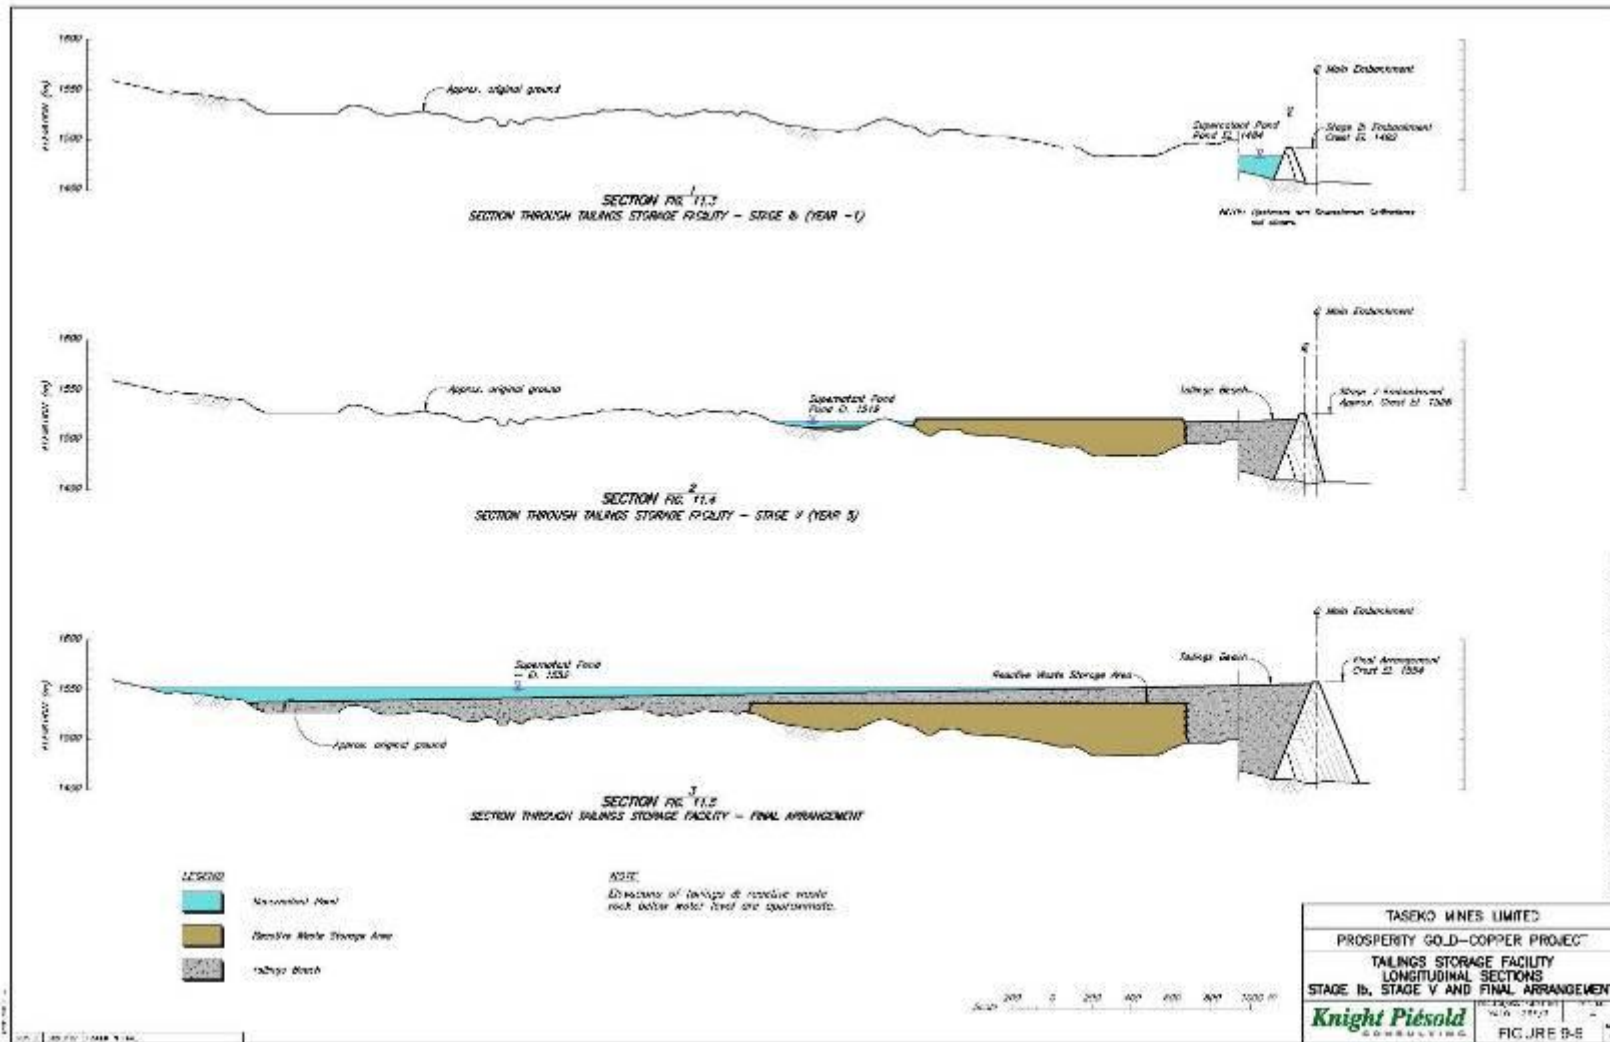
Tailings Storage Facility–Longitudinal Sections–Stage Ib, Stage V and Final Arrangement
